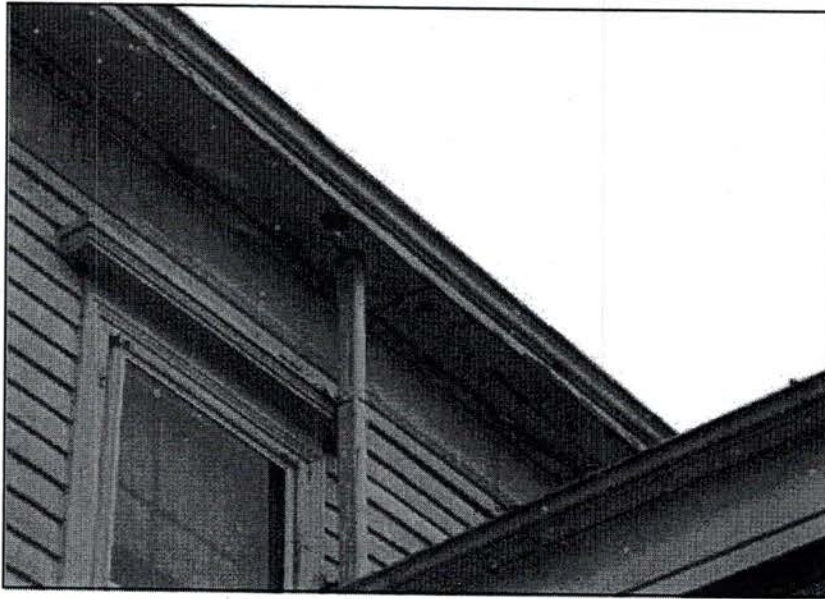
The cornice and window details seen on the front and sides of the house were not extended to the rear of the house. Water infiltration caused by deteriorated gutters on the western elevation of the main section of the house has caused the wood of the cornice to rot and the soffit to split.
